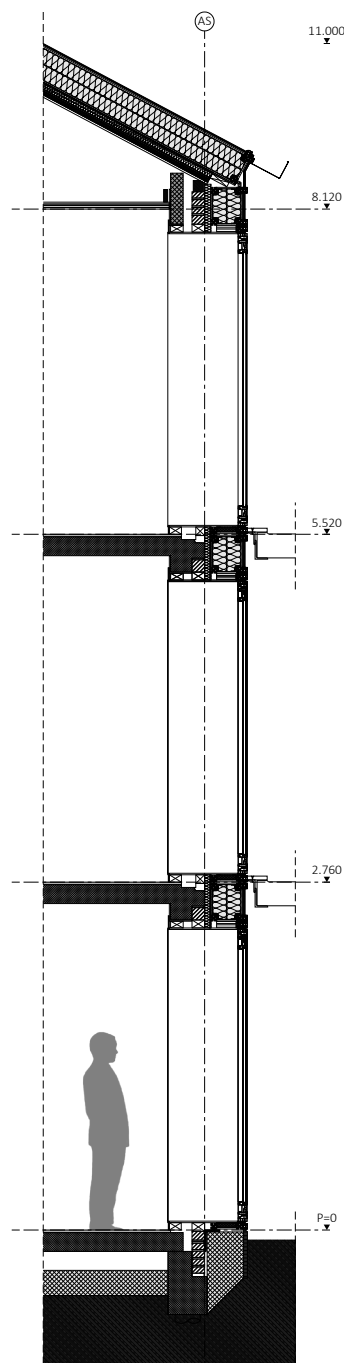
Section | 1:60 | Vertical | North Facade (own illustration).
